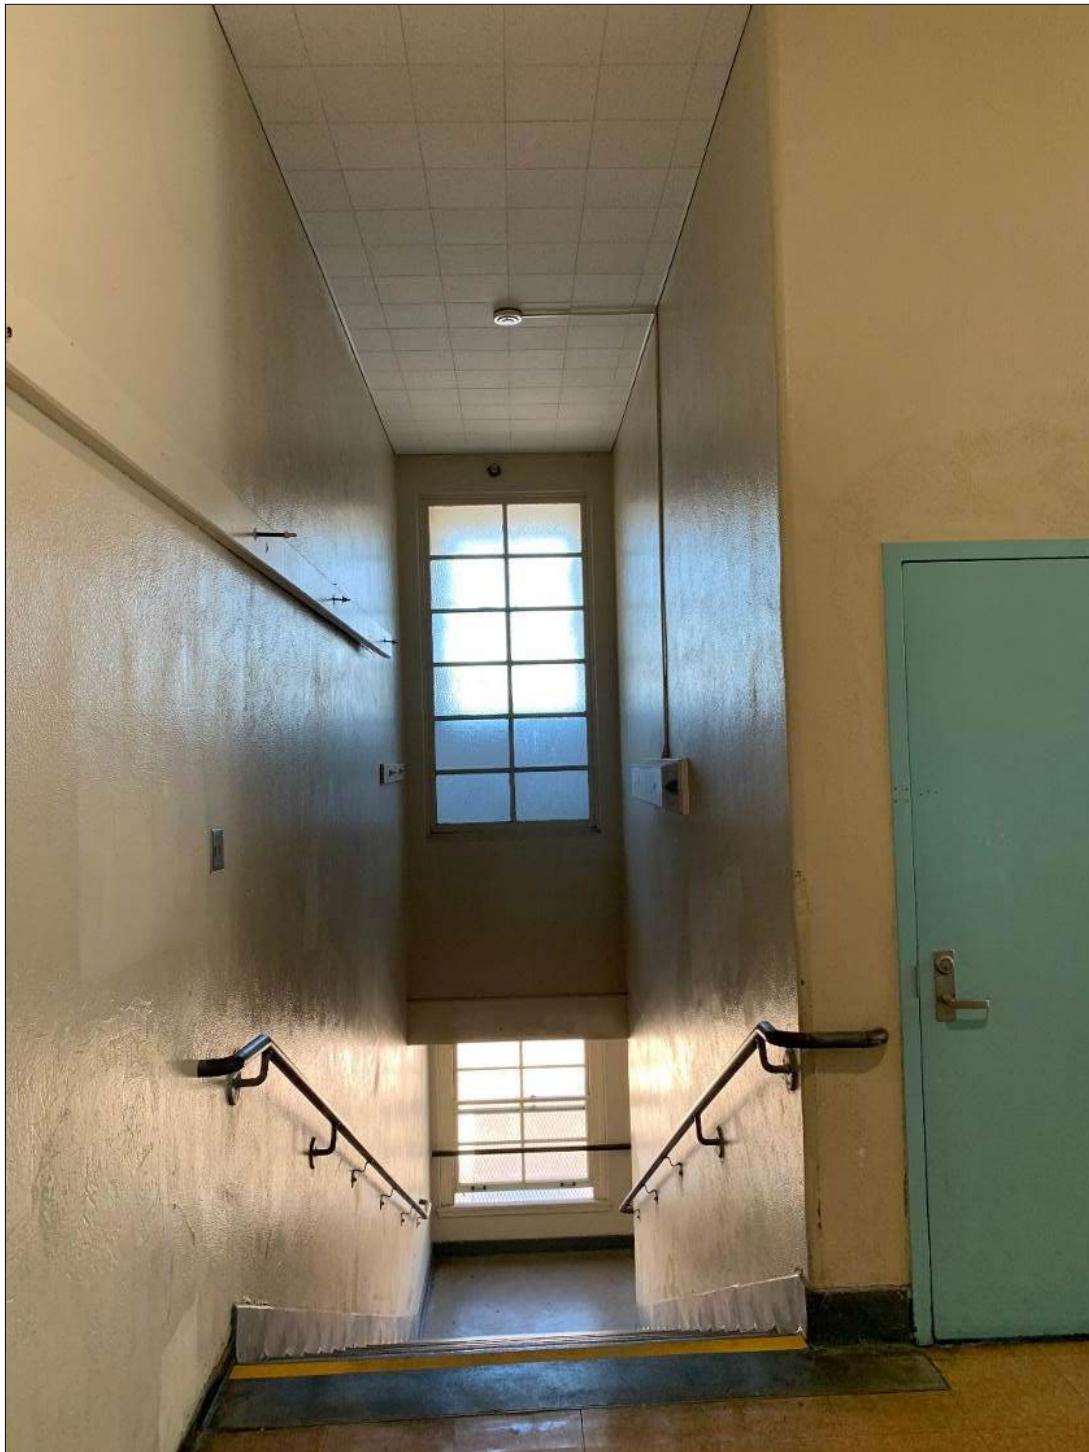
Vertically oriented windows in stairwells in Physical Education Building.
